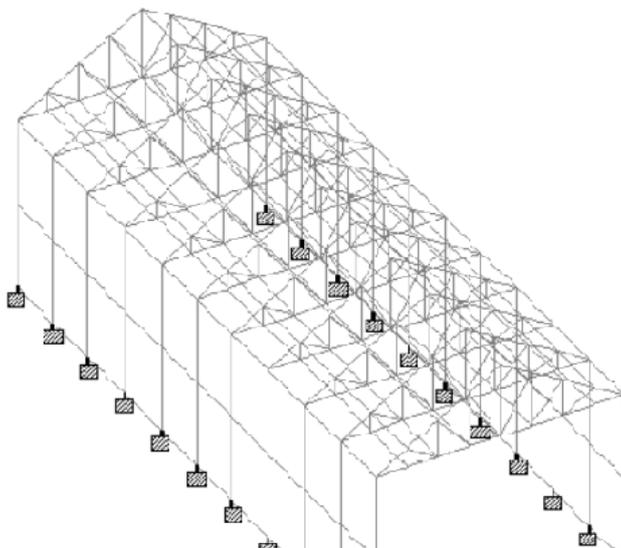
Structure of roof truss from STTAD Pro [Refer from STAAD Pro]
